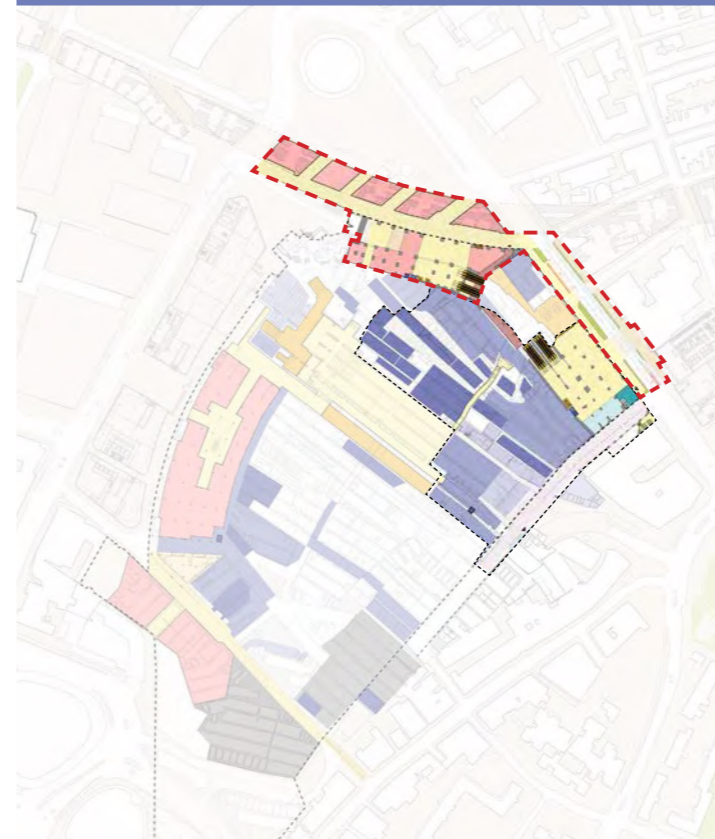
Grade / Undercrofts Level Sketch Plan
